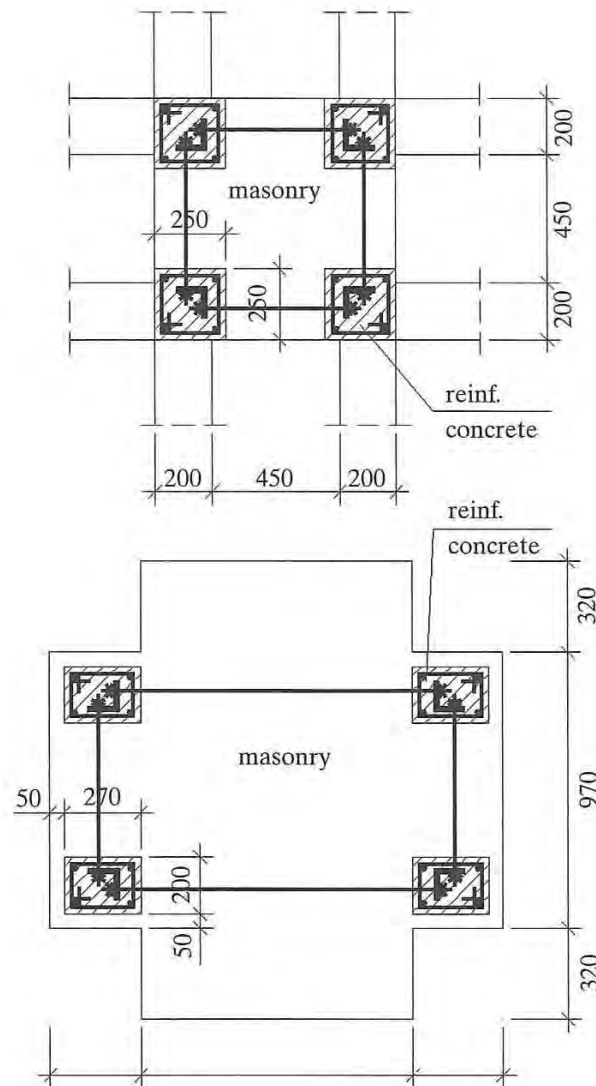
Details of the columns strengthening for Hall 1 and Hall 2
